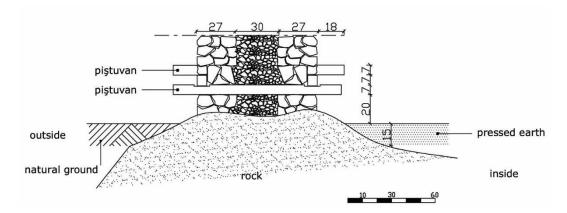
Drawing of the Foundation Type A (Çelik 2009)
